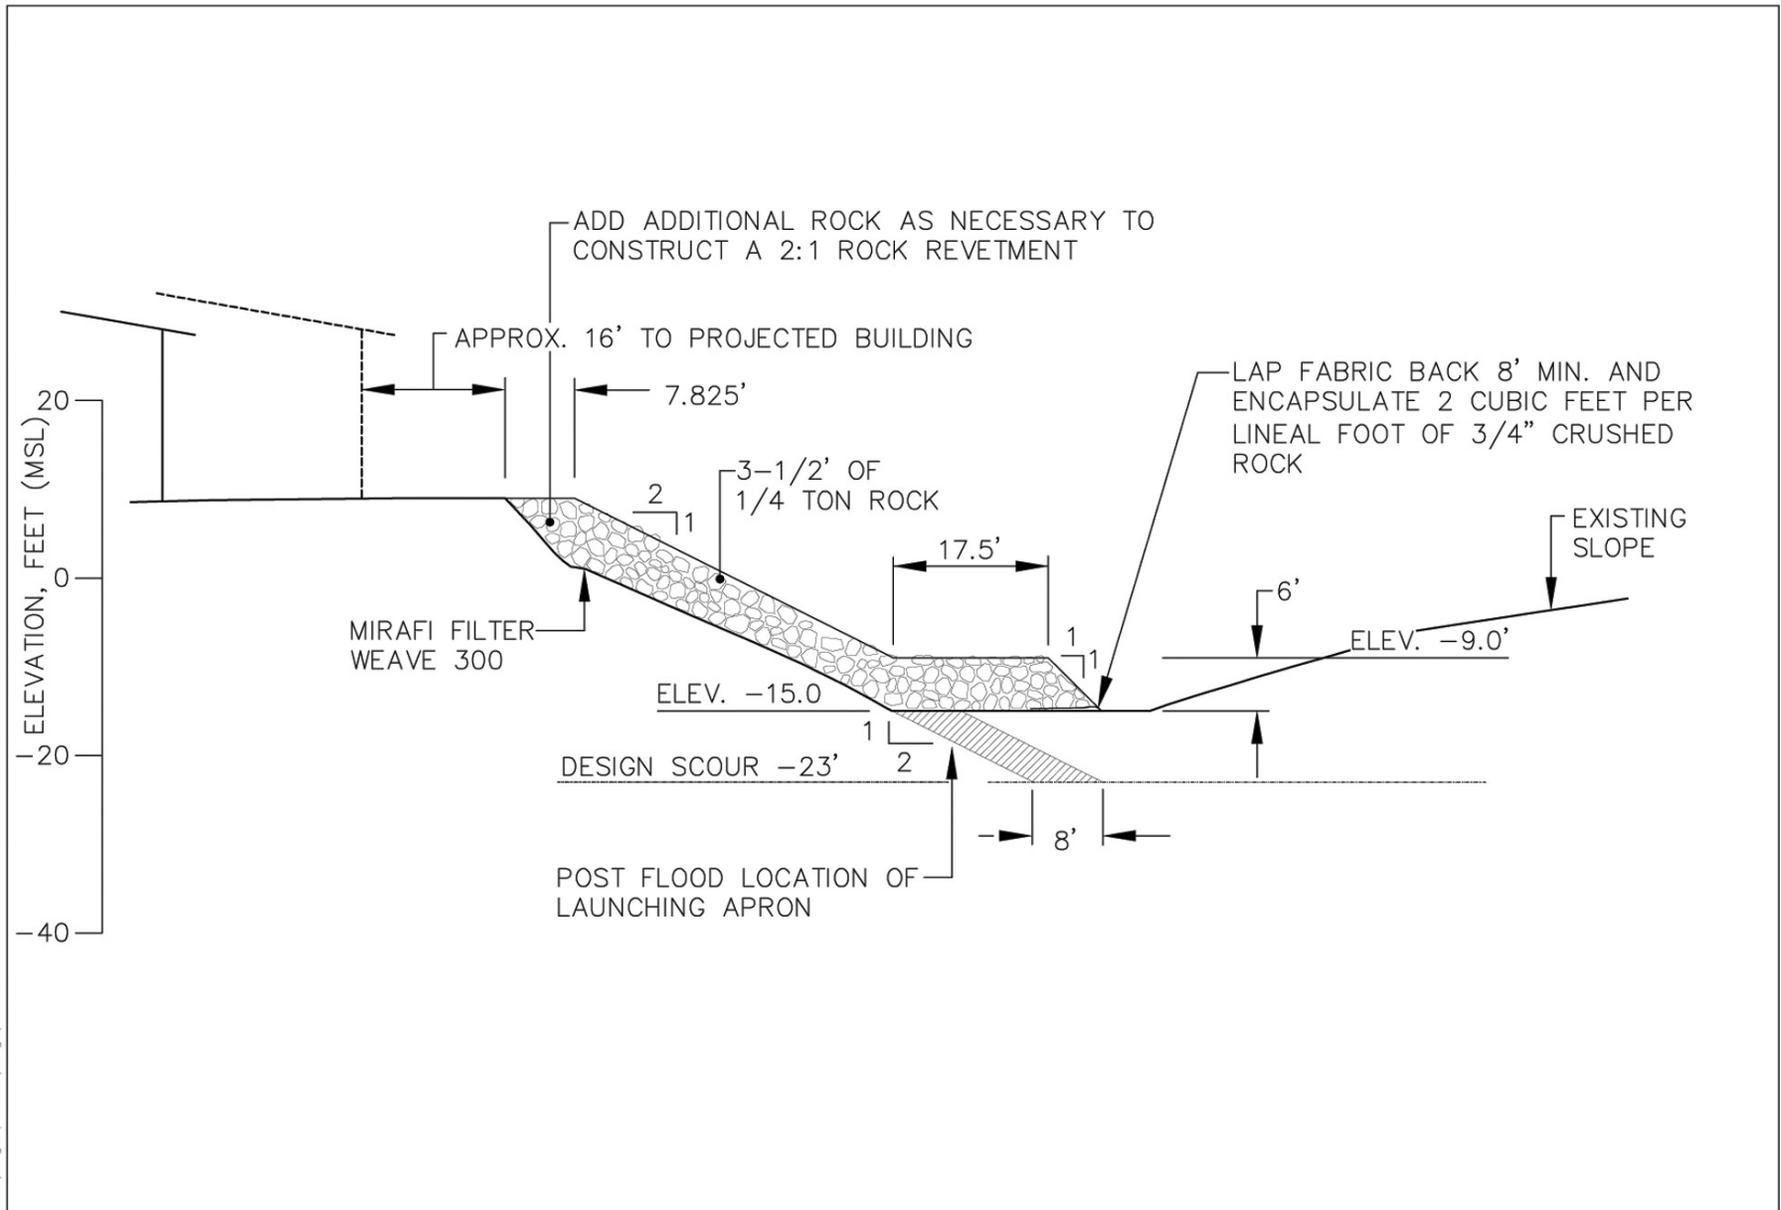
Typical Section of Slope Protection Stone Revetment No. 1
